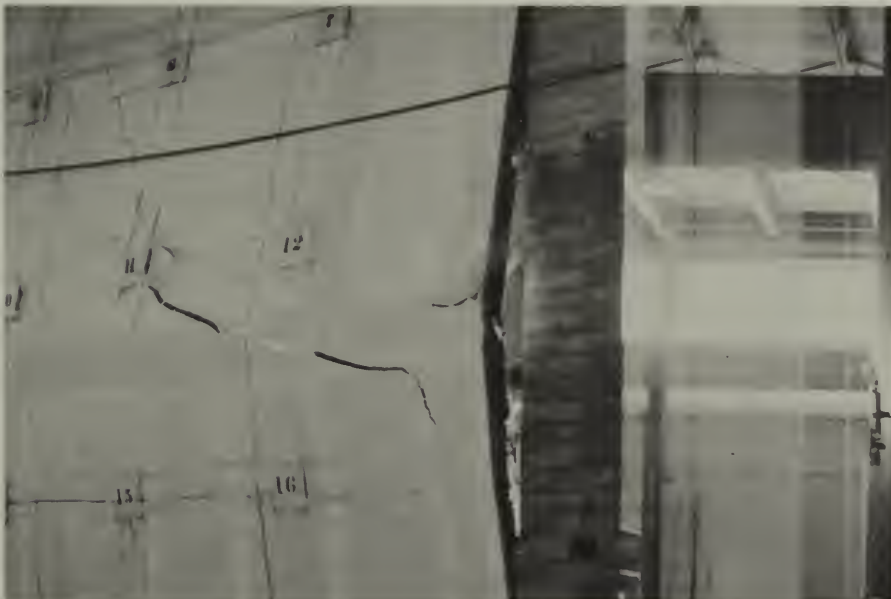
The resultant crack formed at mid-height near the north quarter point of the assembly.
